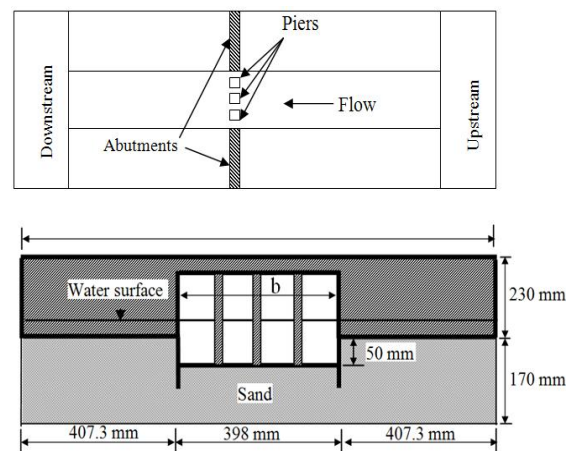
Experimental Bridge model a) Plan for normal crossing b) Cross-section [15]
